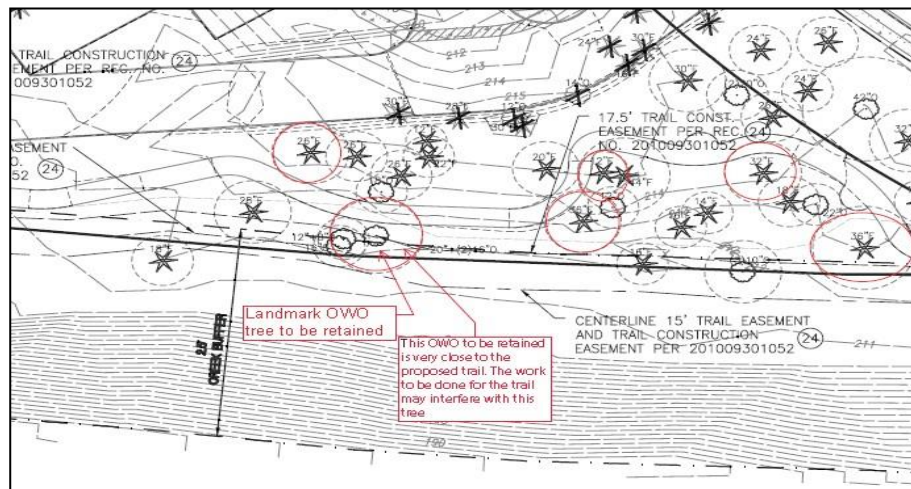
Tree Protection Radius within proposed grading and impervious surfaces
